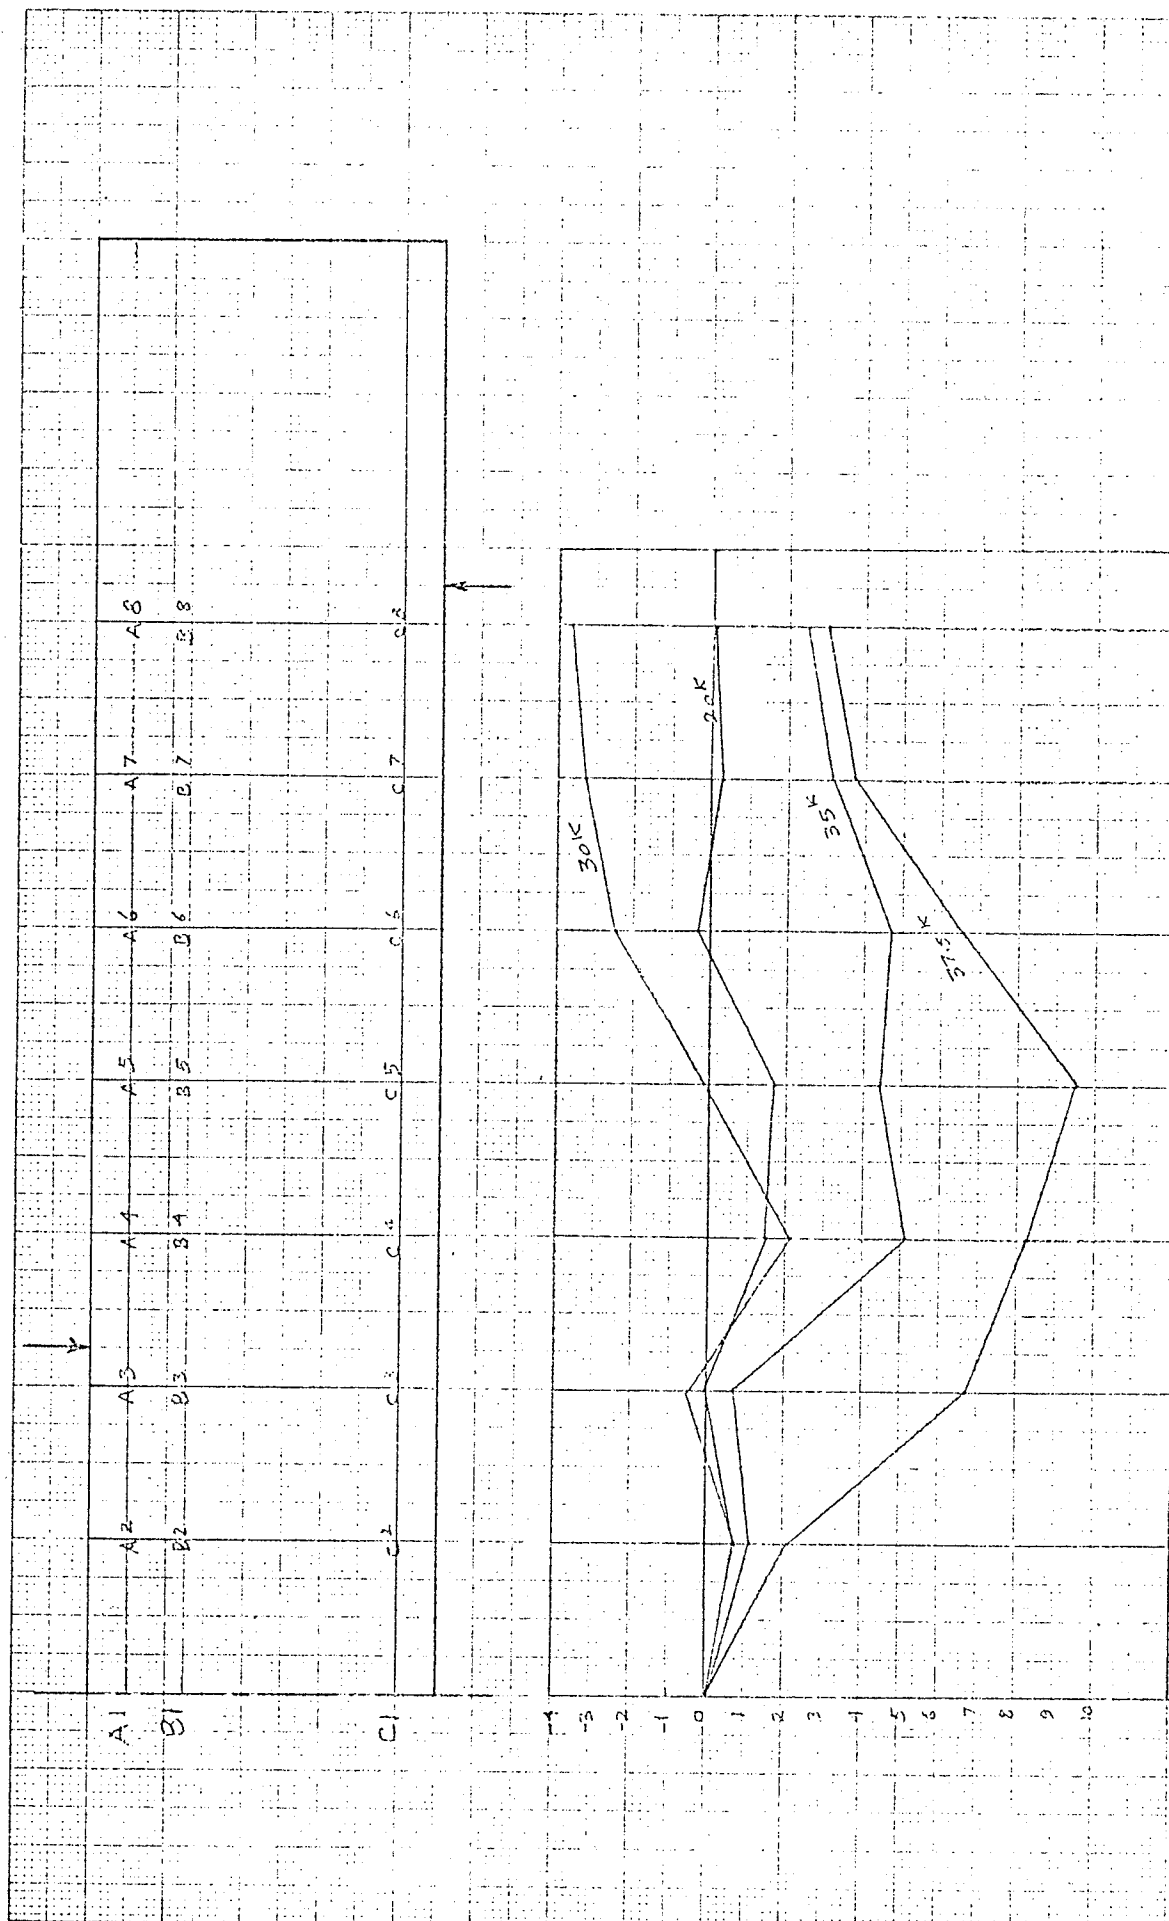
Series IA: Horizontal Displacement of Concrete Cantilevers
